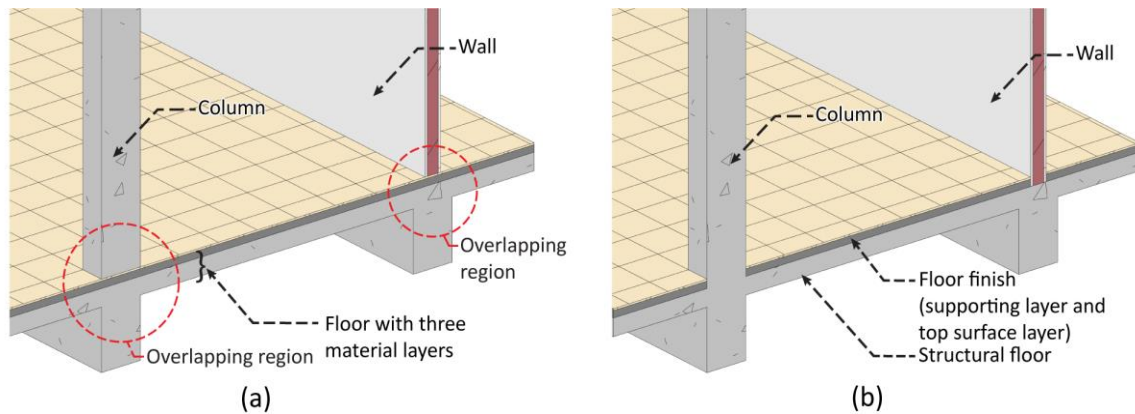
(a) The architectural floor (floor finish) is placed under the column and wall, causing excess floor material quantity. (b) The correct modeling method separates the architectural floor (floor finish) from the structural floor to avoid the overlapping regions.
